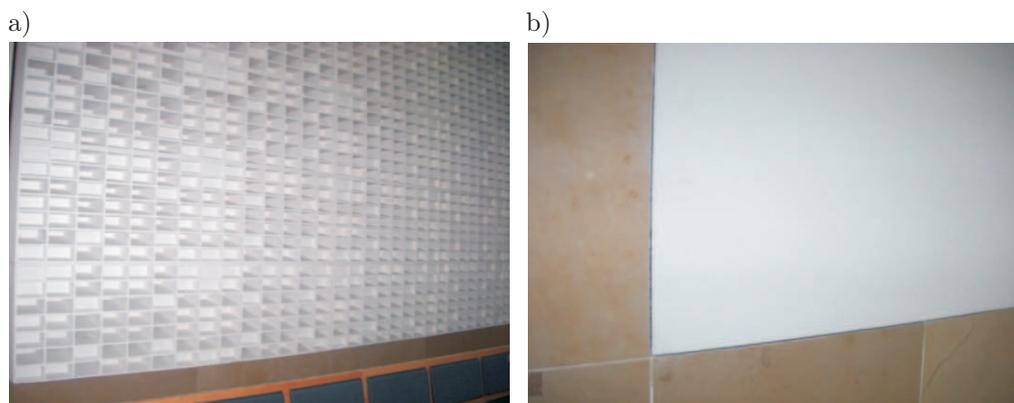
Diffusers (on the congregation rear wall) (a) and wall with absorptive *Acoustaplan* (white on photo at b)).
